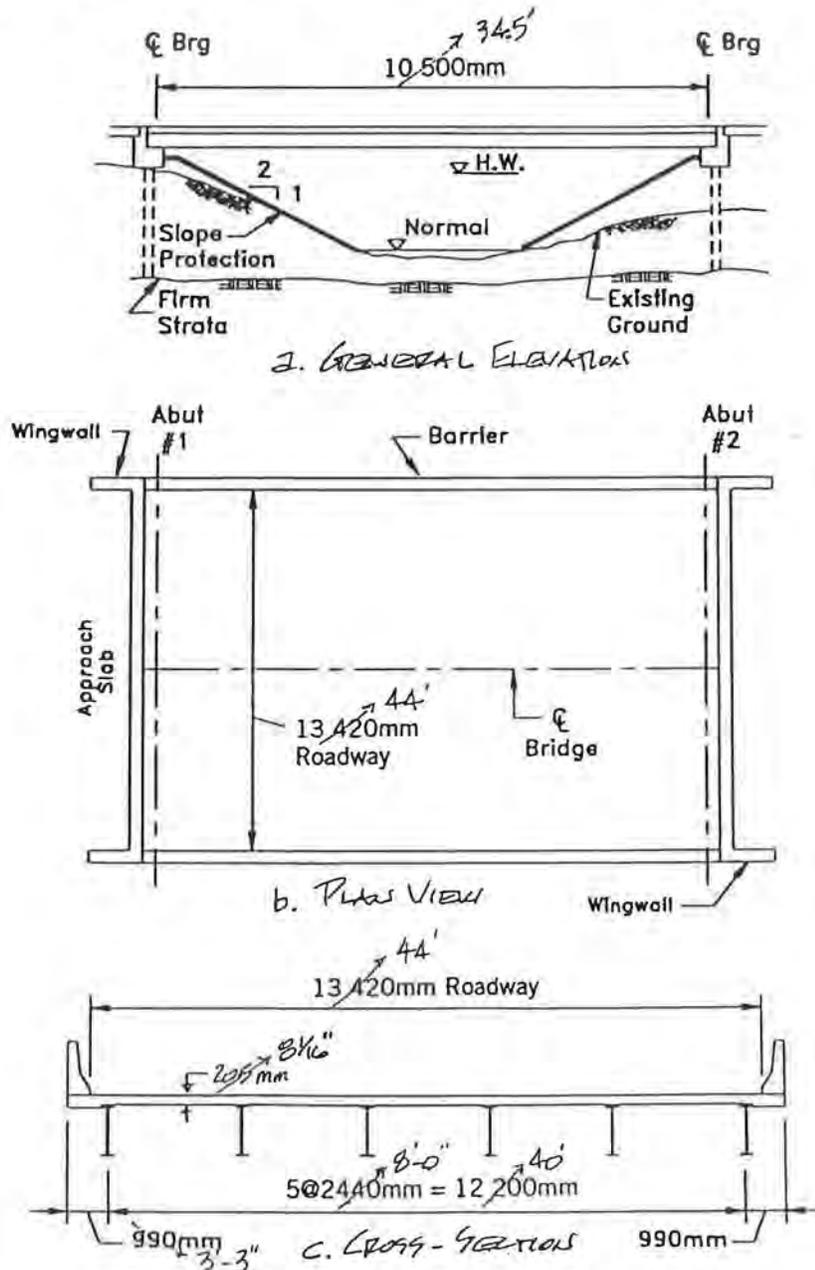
Noncomposite rolled steel girder bridge design example ().
